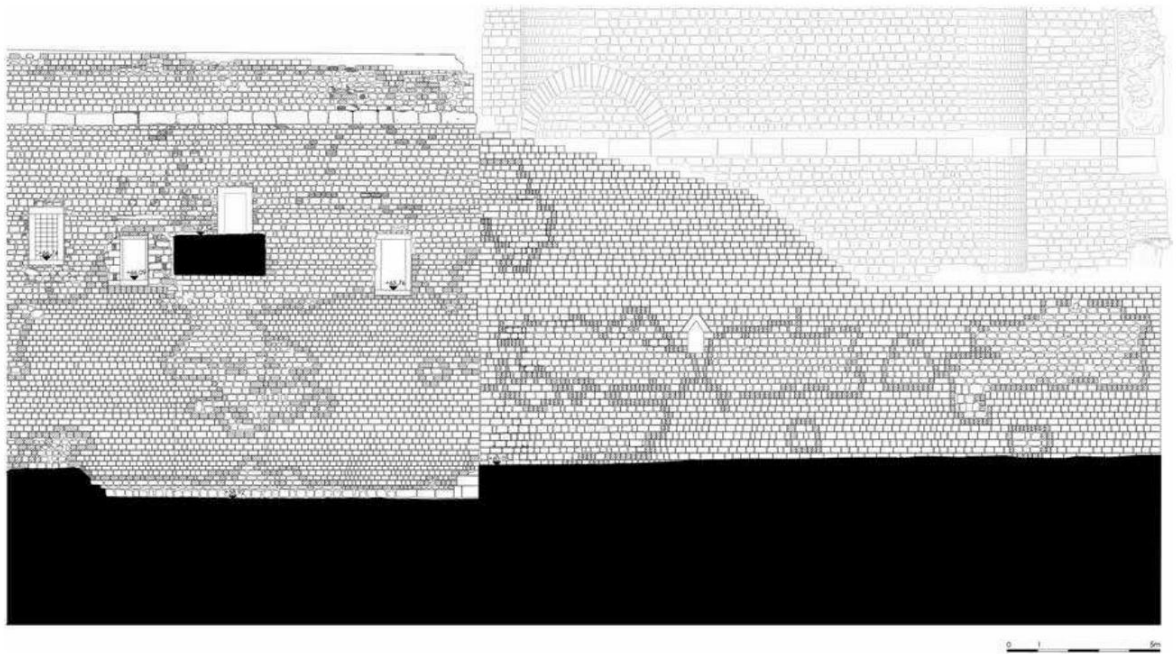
Pergamon, red hall. Restoration project for the large retaining wall of the Temenos, on the right the wall shells that have already been added, on the left the planned closing areas of the masonry (M 1:250)
